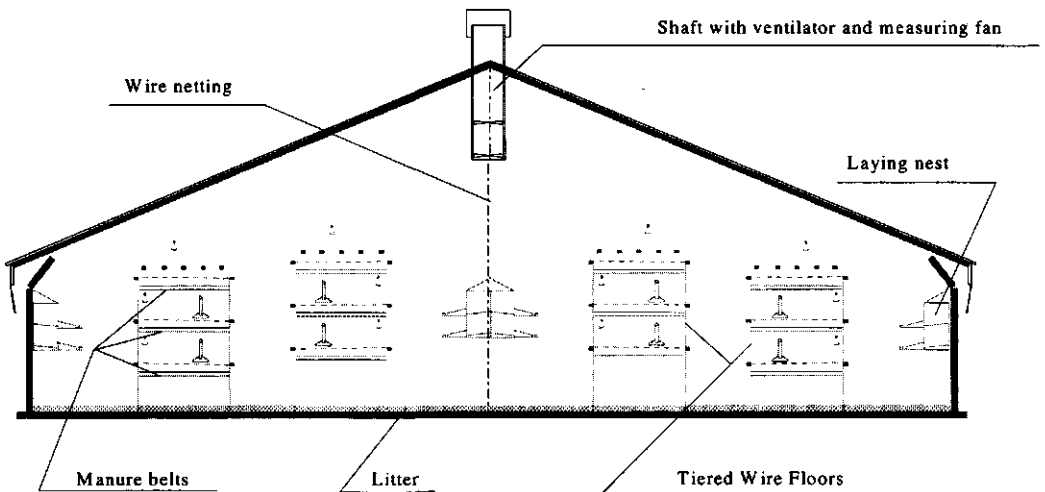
Cross-section of the Tiered Wire Floor (TWF) system.
